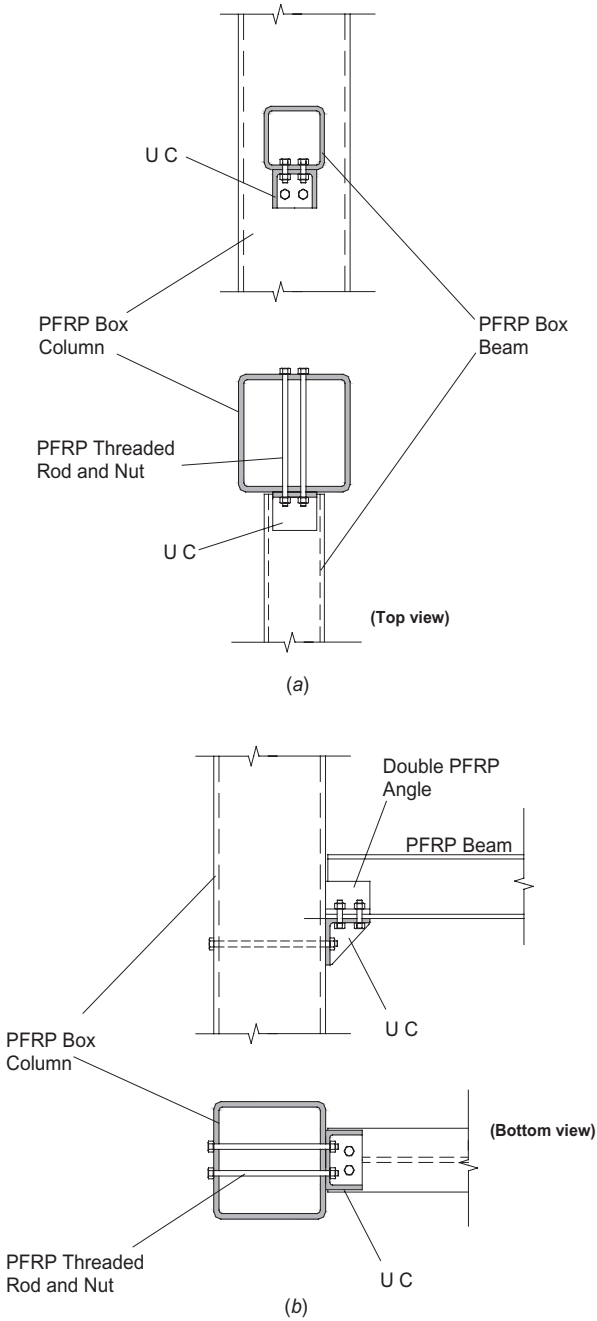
Flexible exterior (UC seat) PFRP beam-to-column connection details.
